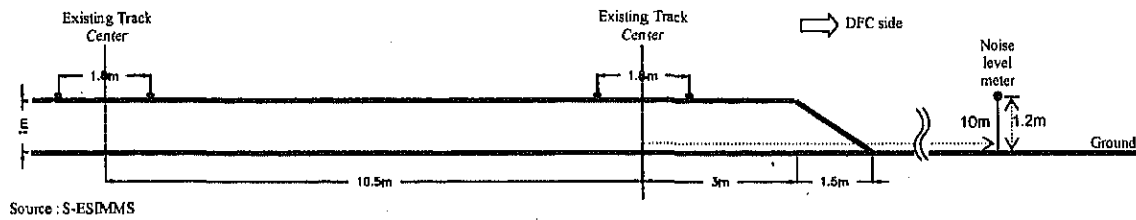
Cross-section view of AB-2 measurement site in Abu Road
